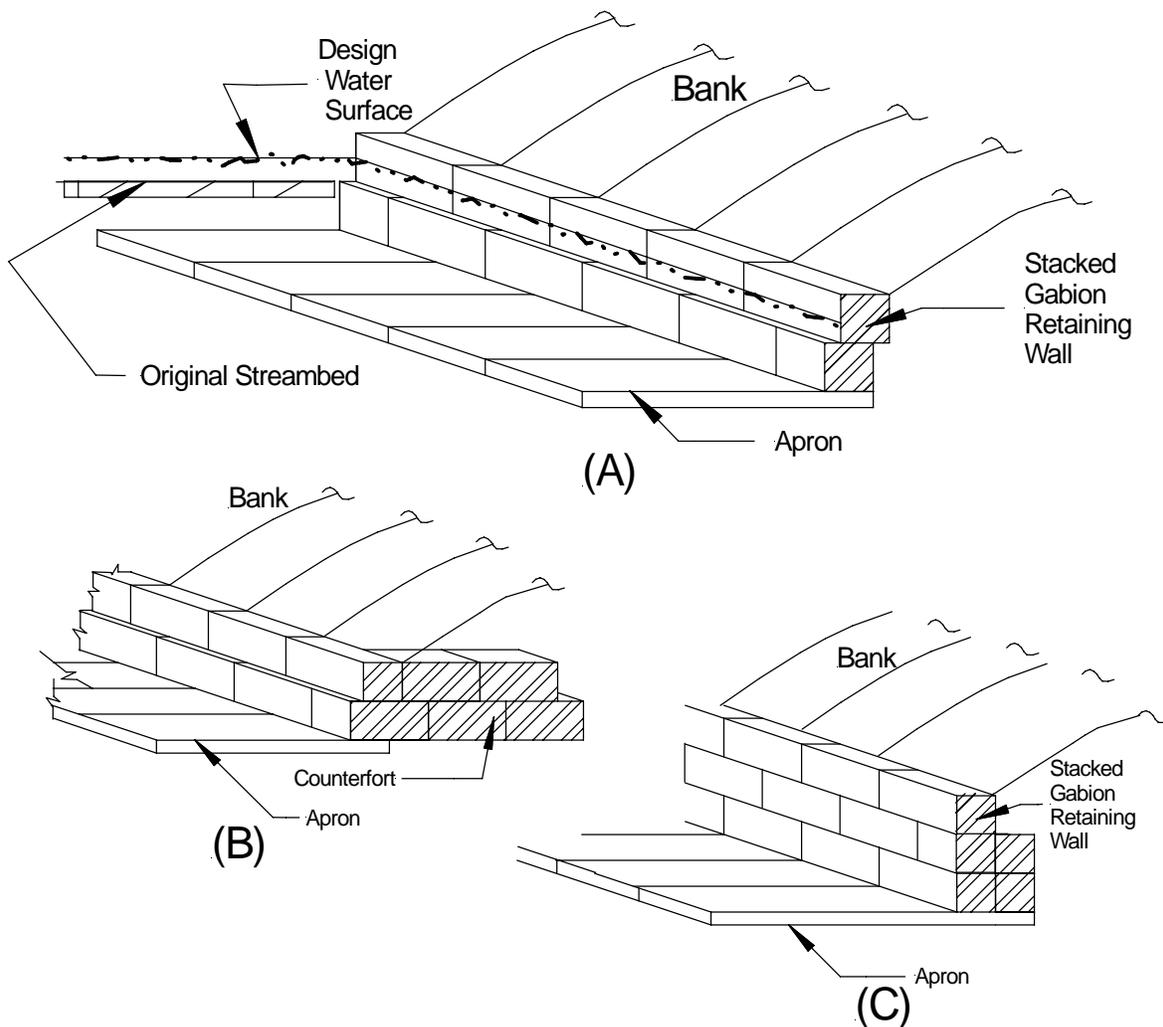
Typical Stacked Block Gabion Revetment Details: stepped back low retaining wall with apron.
